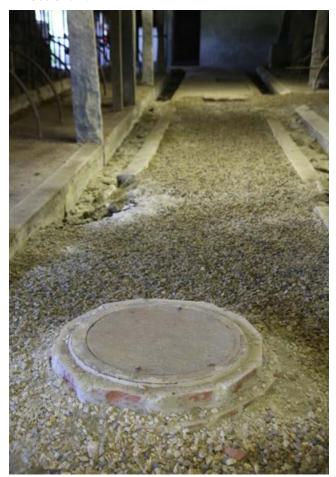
Basement milking area floor, showing stormwater drainage system in floor installed in 2004
